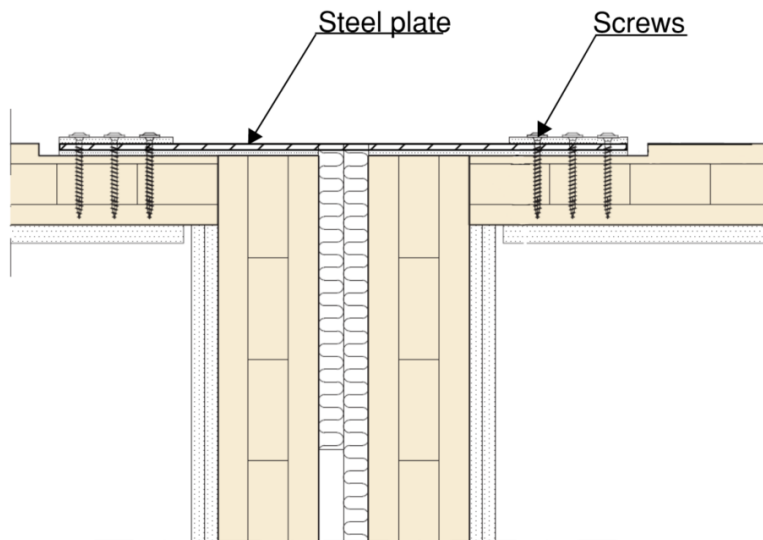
Example of a horizontal connection with a steel plate and self-tapping screw fasteners
